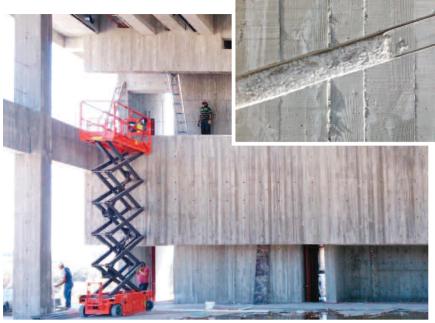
Wood formwork concrete - with imperfections of concrete and the traces of wood
